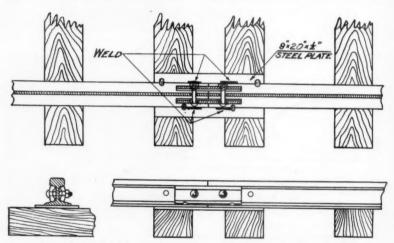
Welded and bolted joint combines strength with electrical efficiency
